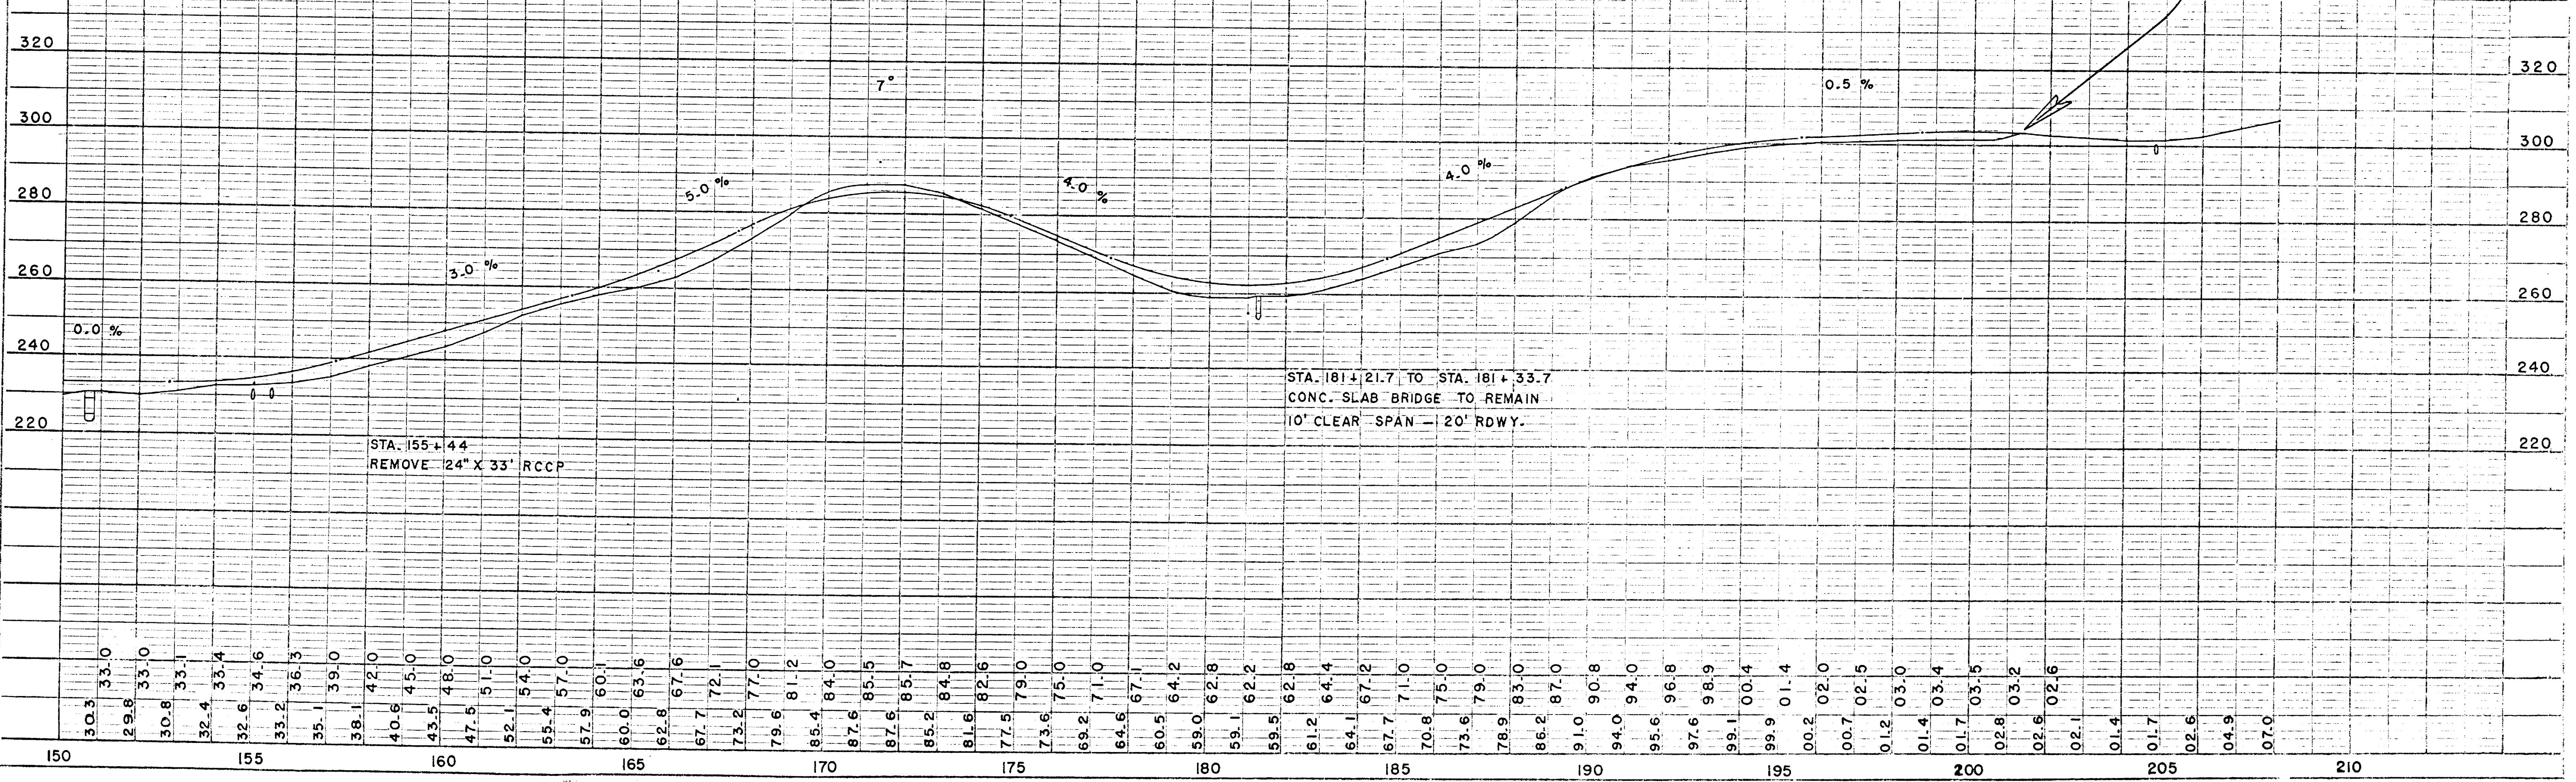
PLAN PROFILE & P.R. STANDARD
